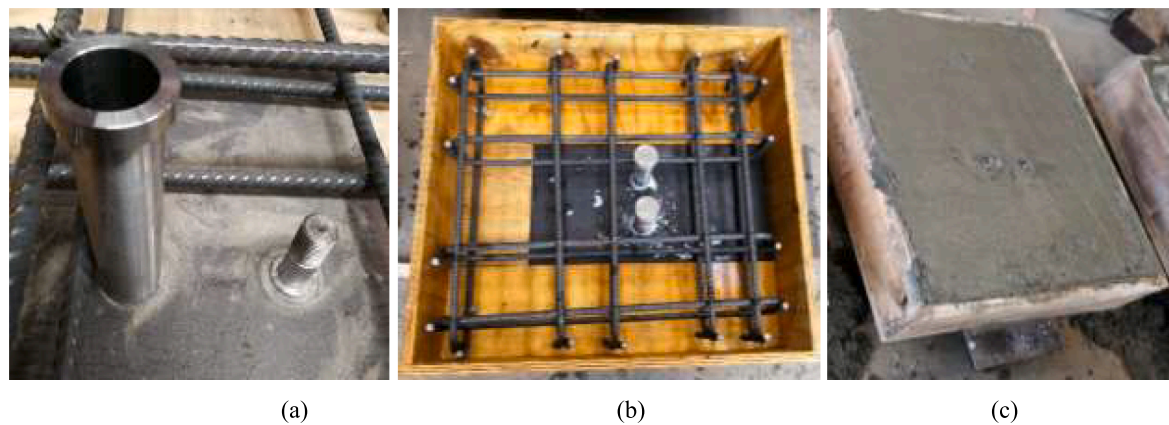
Specimen preparation in the Lab: (a) Assembled shear connector without grout on steel section; (b) filled in grout, installed reinforcement cage and formwork; (c) cast concrete.
